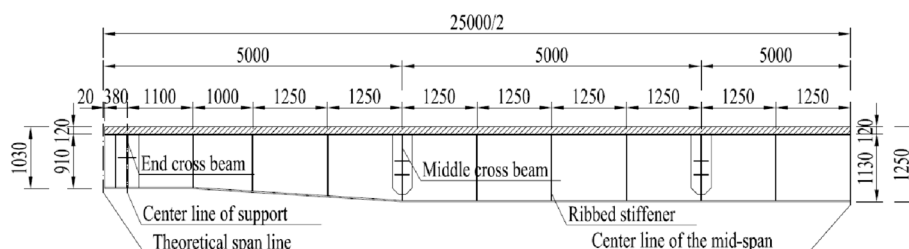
Facade layout of the lightweight steel-UHPC composite beam (mm)
